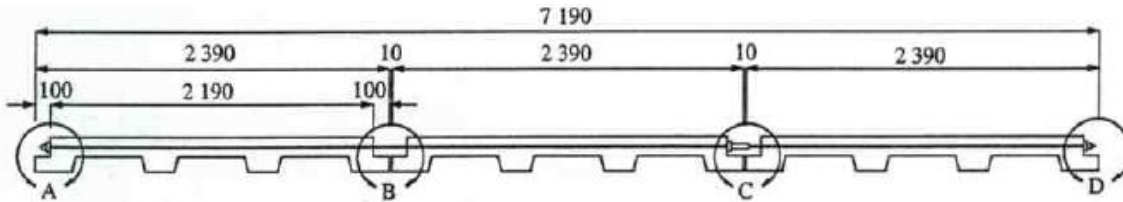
Cross section of a box girder bridge system with transverse post-tensioning (El-Remaily et al., 1996)
